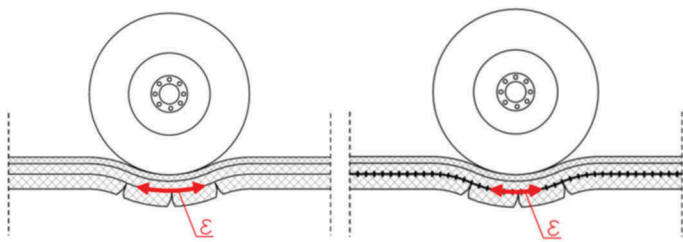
Schematic view of the fatigue cracking mechanism in pavement cross section without and with reinforcement.
